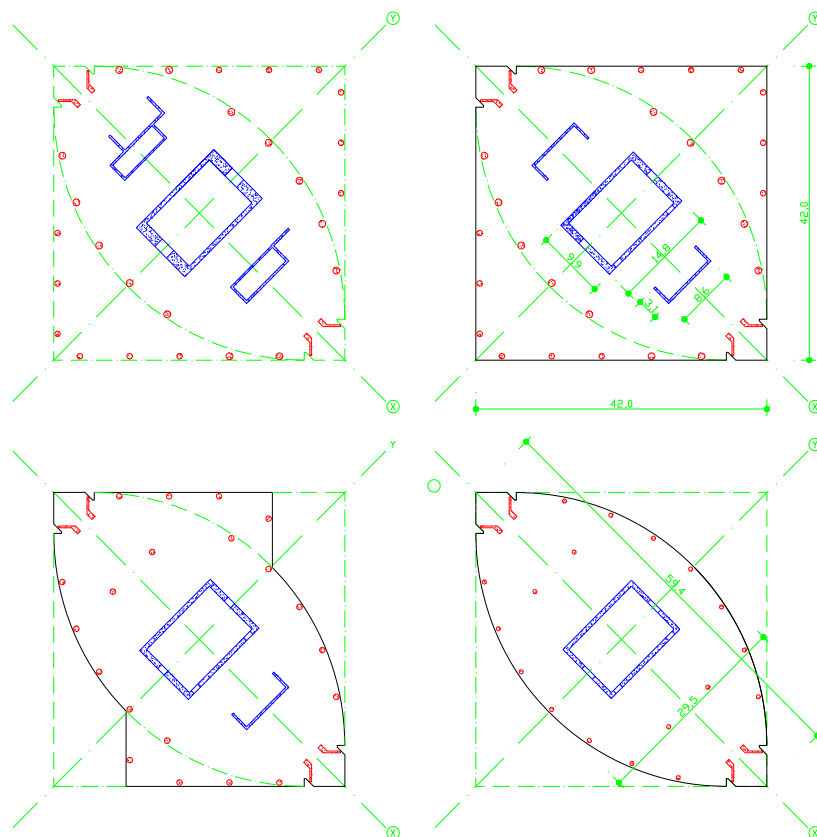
Typical floor plan at basement, low-, mid- and high-rise level
